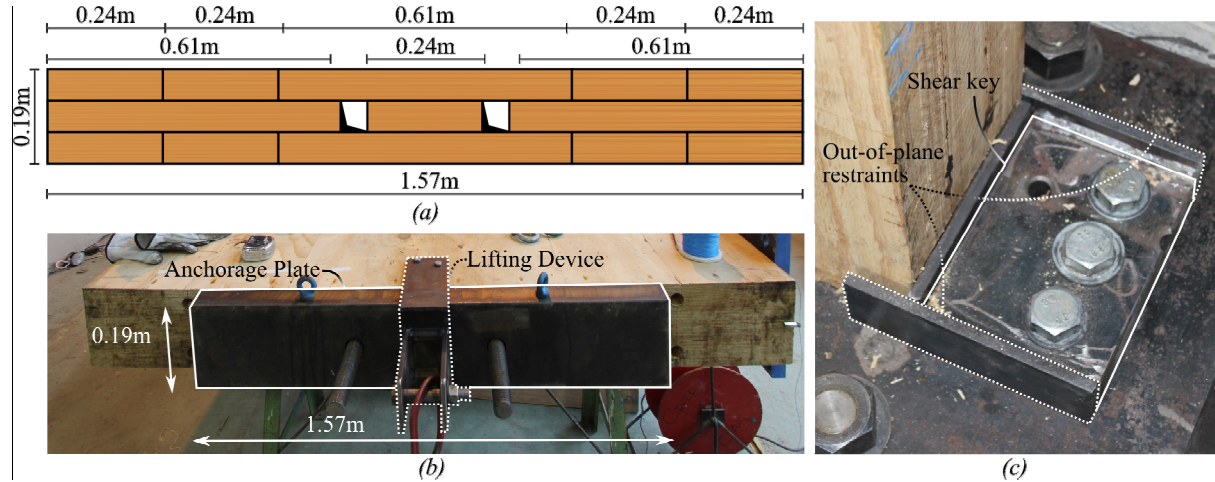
(a) Wall section. (b) Post-tensioning plate detail; (c) shear key
